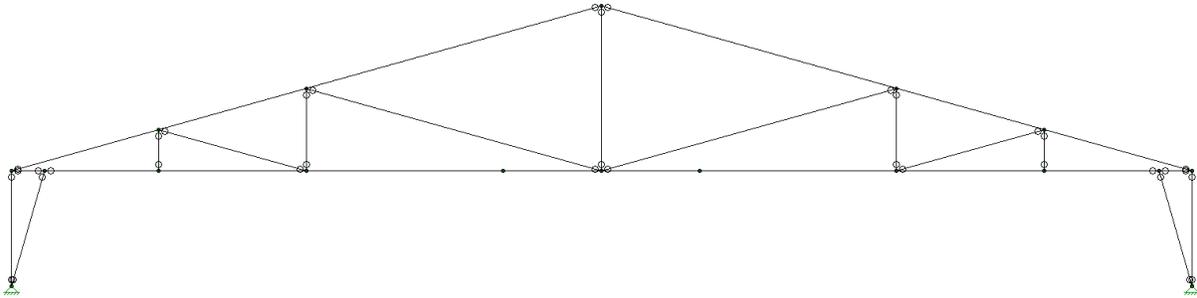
Double Howe (KK) Truss Alternative Elevation View
